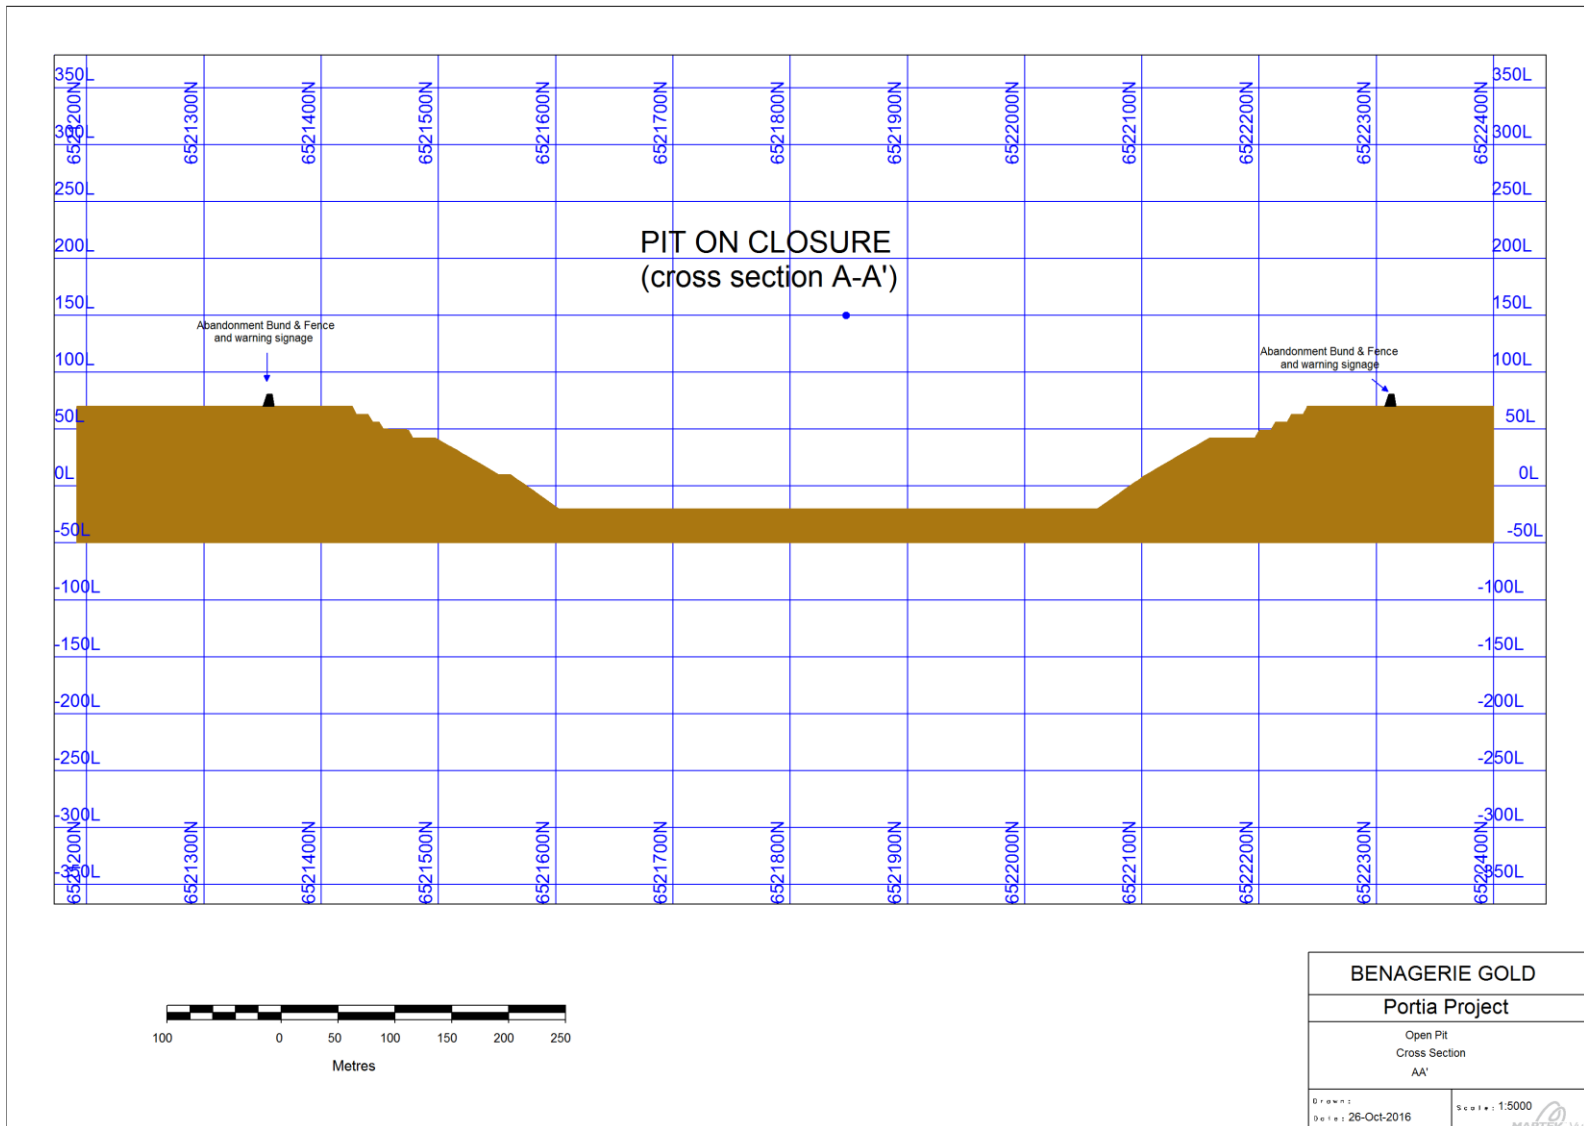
Cross-section A-A' of Portia Open Pit on Closure
